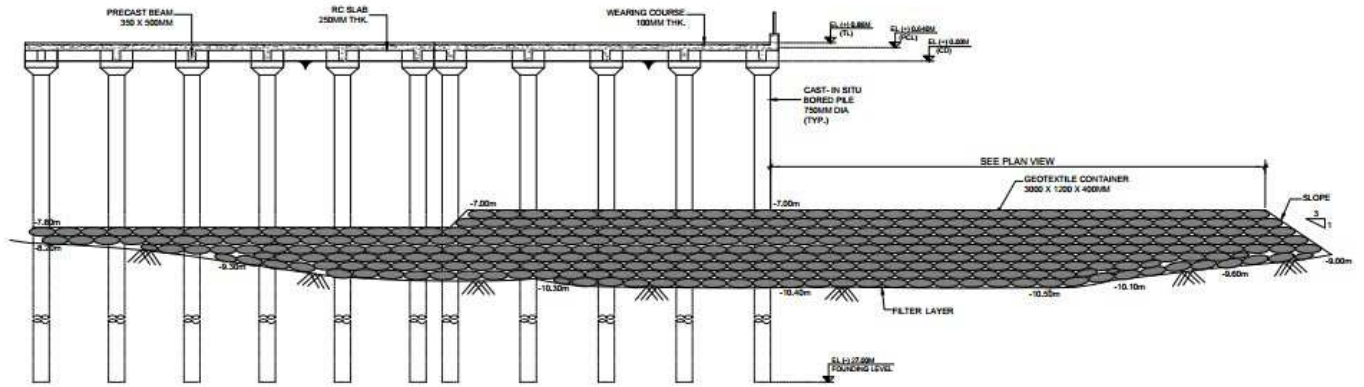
(a) Cross section of Geotextile Sand Containers Arrangements
